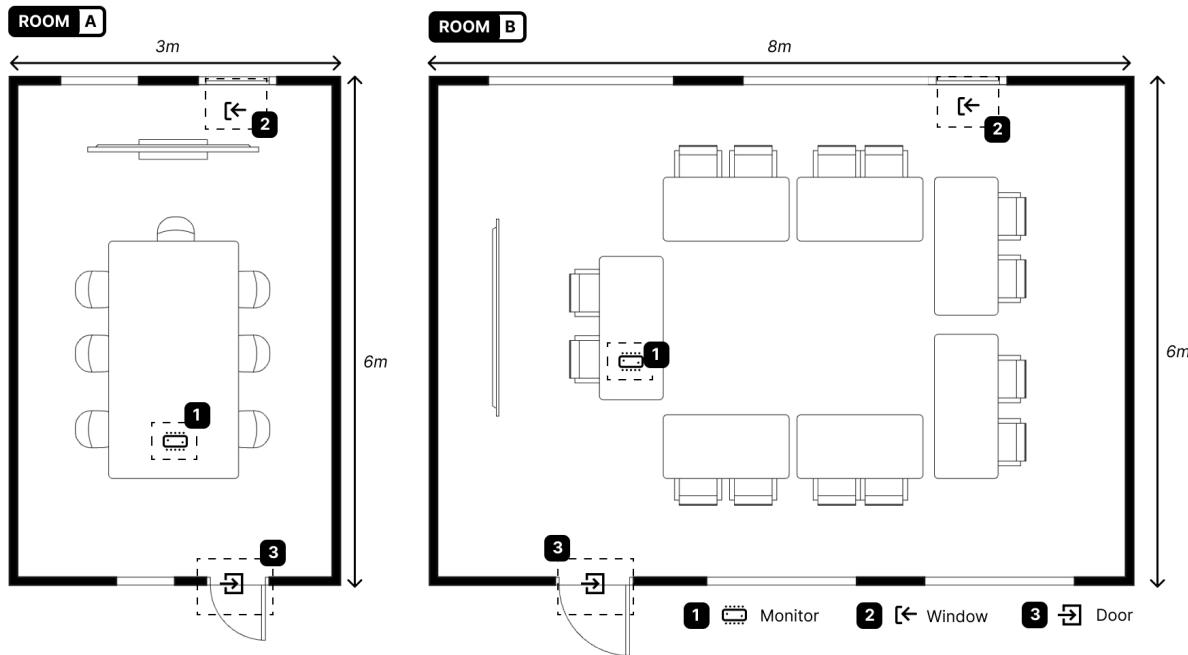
Floorplan of Room A and B, monitors installed as of manufacturer specifications
